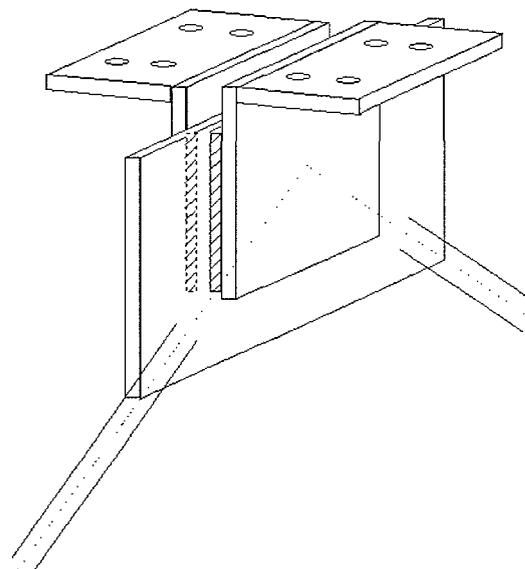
Details of the attachment of the VE devices to the mock-up structure.
